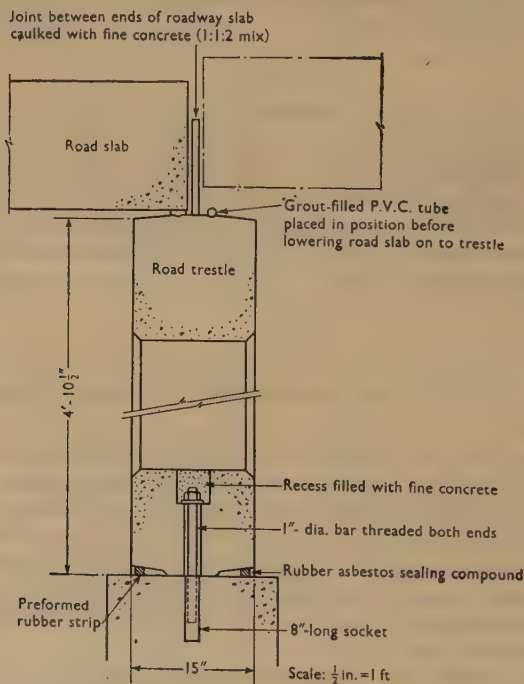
TYPICAL DETAILS OF TRESTLE CONNEXIONS
